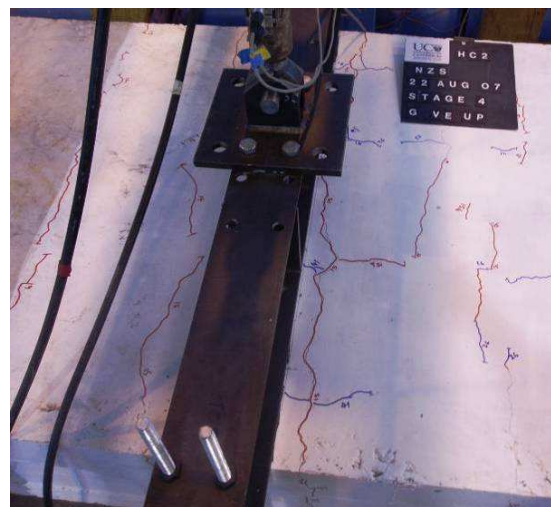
Crack at beam-floor interface on top surface of test unit during HCW2 test
